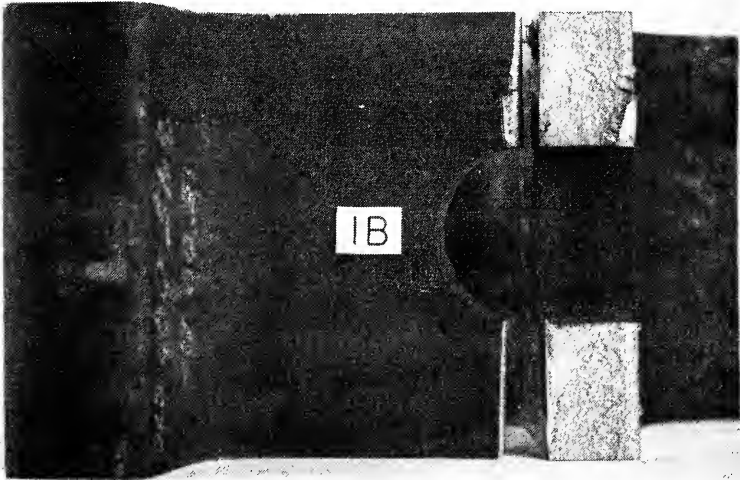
Typical fatigue failure produced in laboratory.
